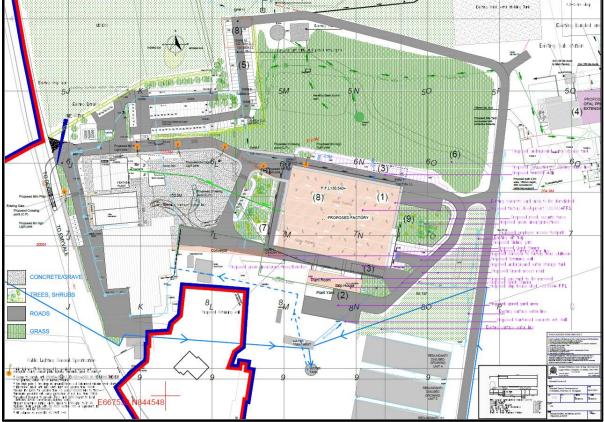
Site Layout Plan (Source: Silverhill Foods Ltd.)
